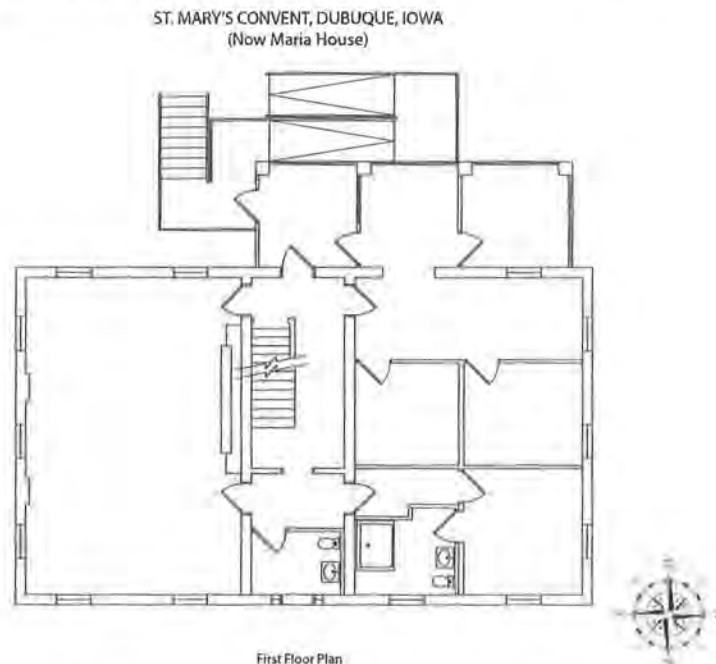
St. Mary's Convent (Maria House) First Floor Plan - January, 2012.¹⁵
